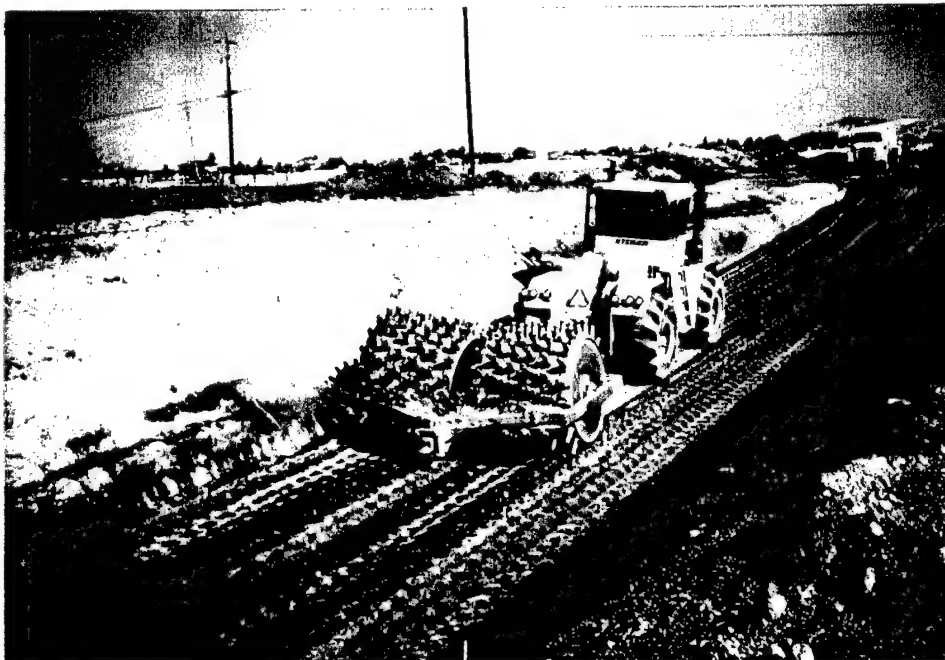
Towed roller used for compaction in the inspection trench. 8 Oct. 1990
